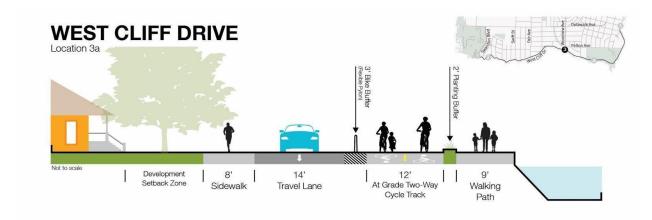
Alternative 2 Concept- Cross Section of Just west of Woodrow Avenue at West Cliff Drive
